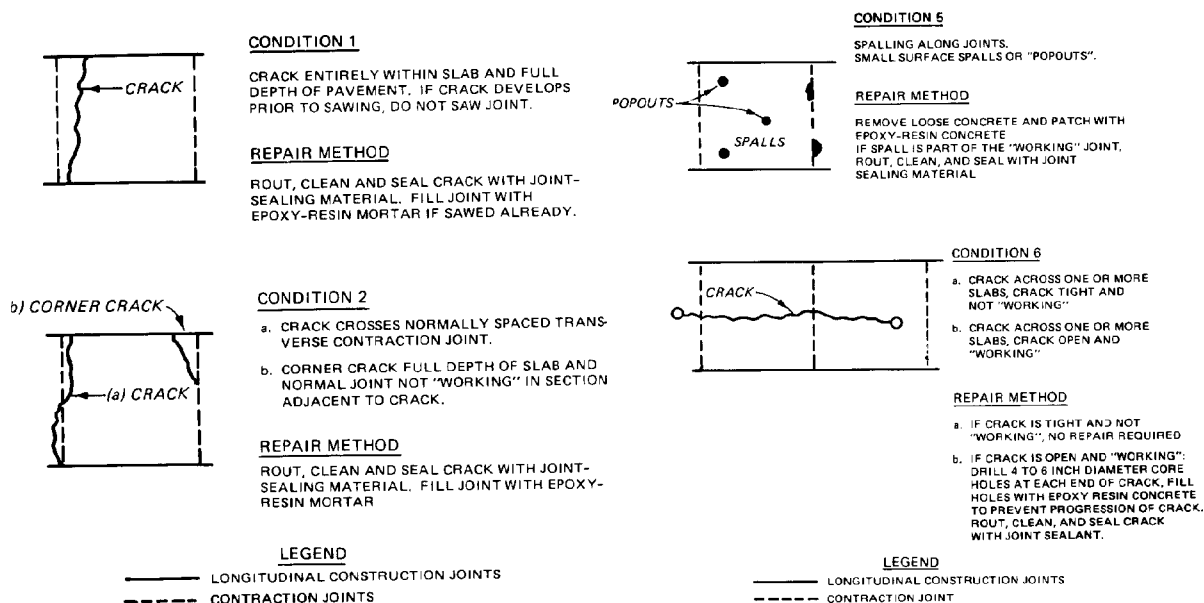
Approved methods for repair of uncontrolled cracks and spalls in rigid pavements.
